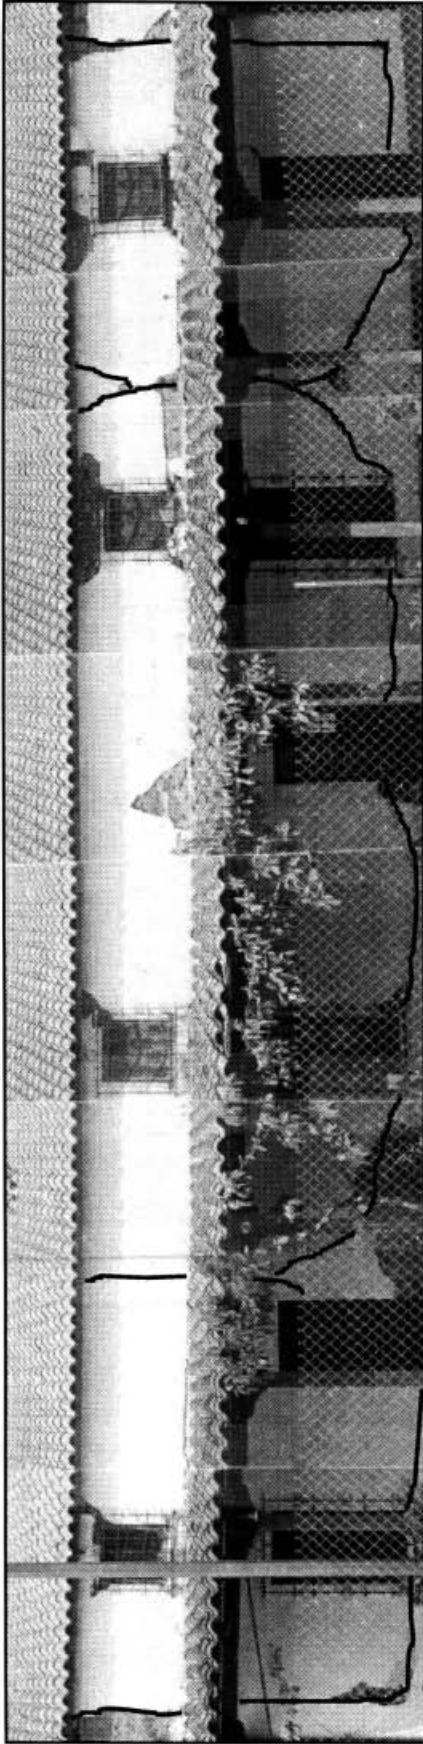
Andres Pico Adobe. Cracks caused by out-of-plane flexure are highlighted by darkened lines.
